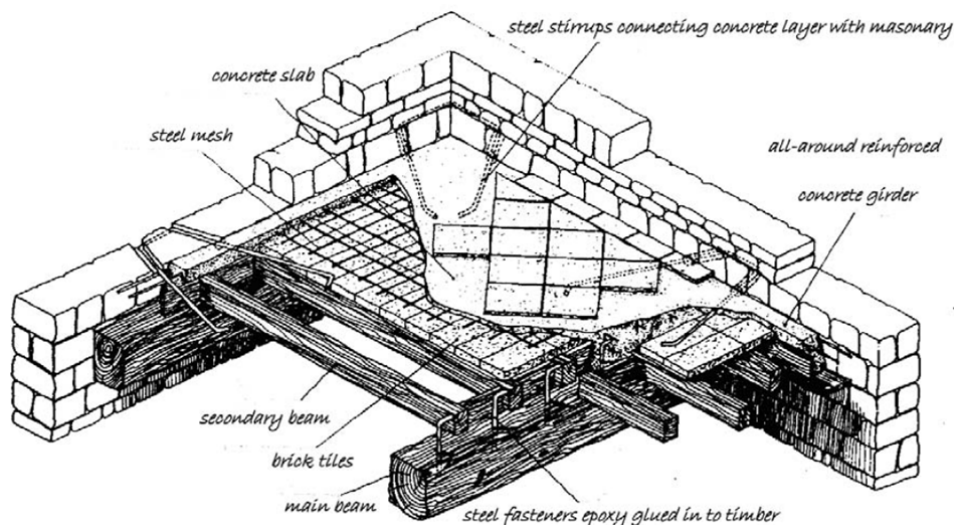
example of seismic strengthening of an existing timber floor in a mid-European masonry building using a timber-concrete composite system (Ceccotti 1995)
